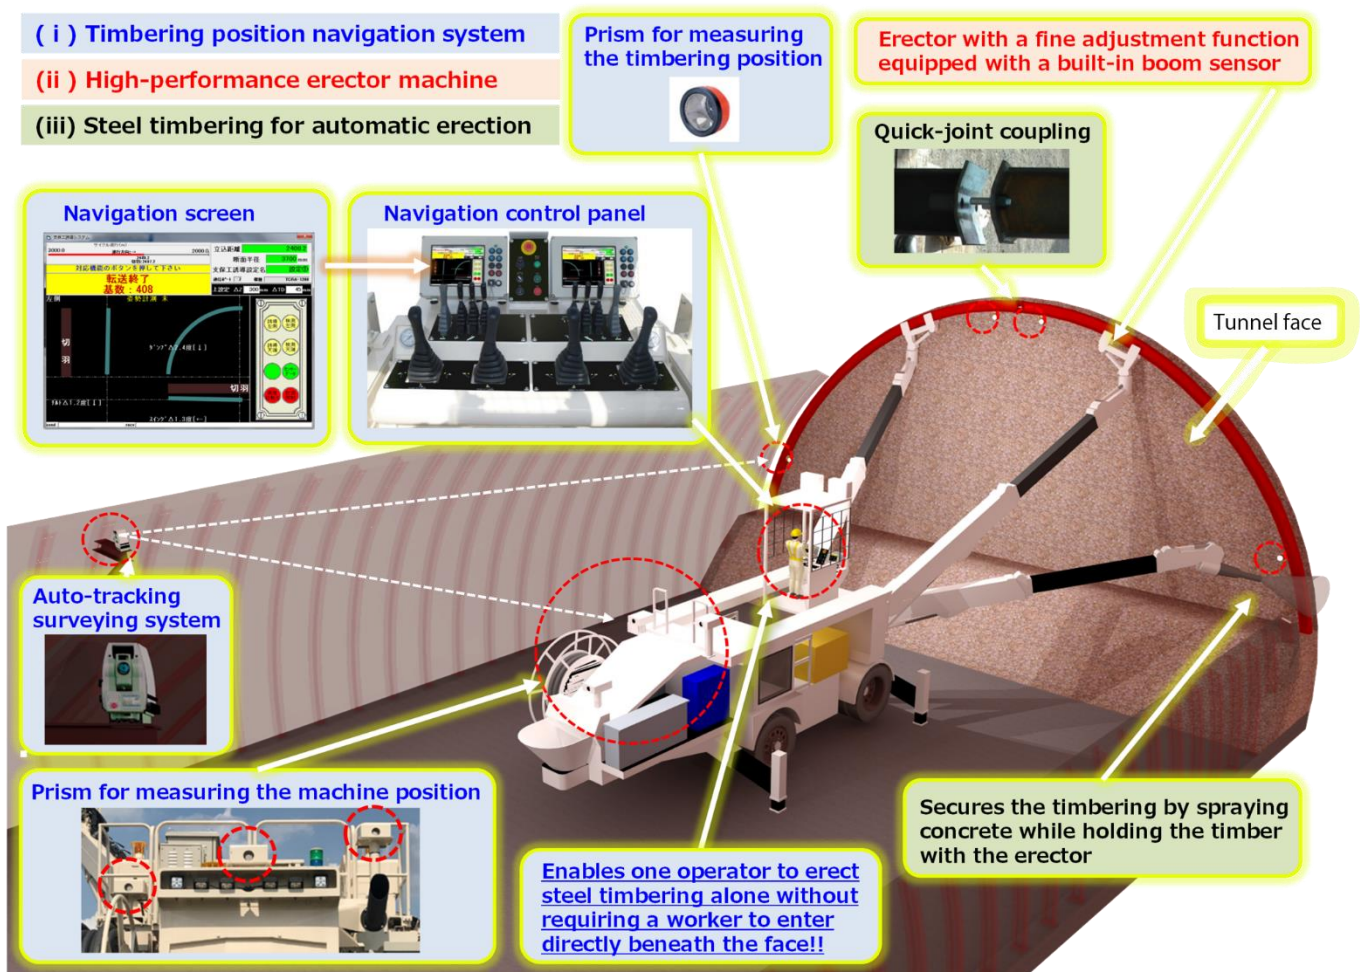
Schematic drawing of the steel timbering erecting robot's system configuration
